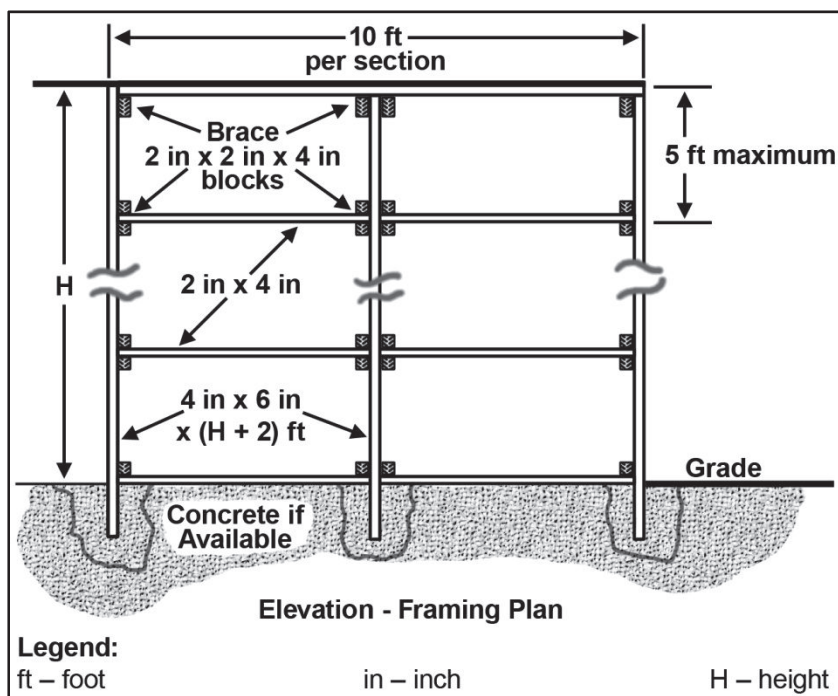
Typical standoff framing with dimensioned wood predetonation screen (frontal)
